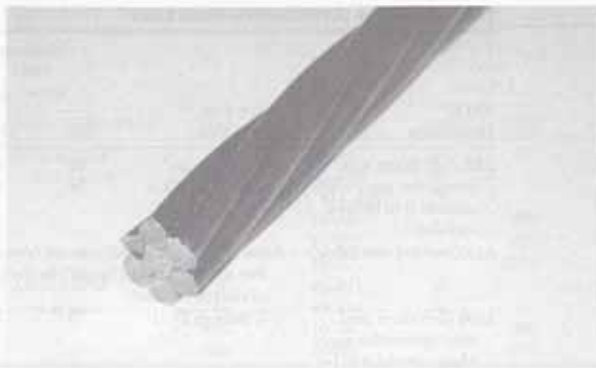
Typical 7-wire strand used in prestressed concrete construction.
